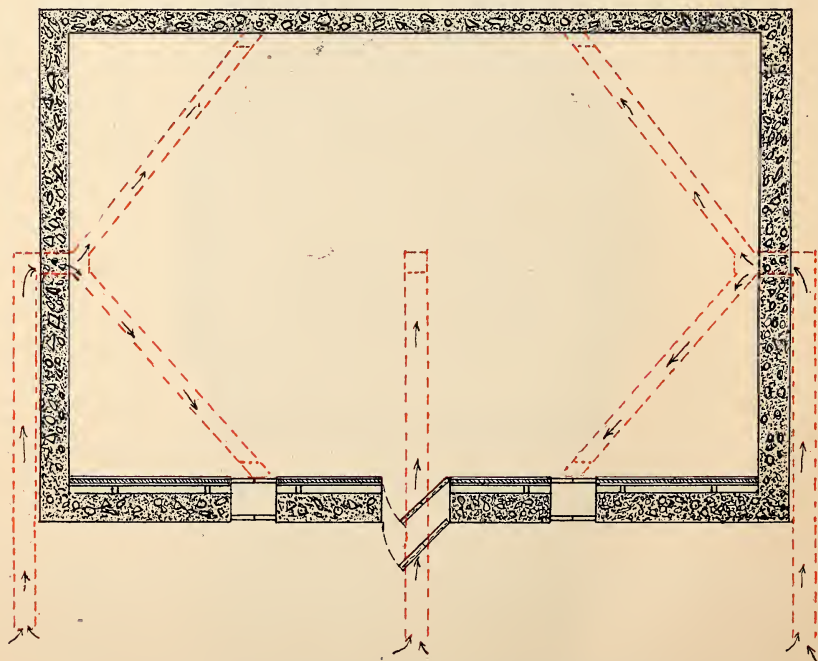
Plan of storage chamber of apple house of Triangle Orchard Company, showing construction of walls and ventilating system.
